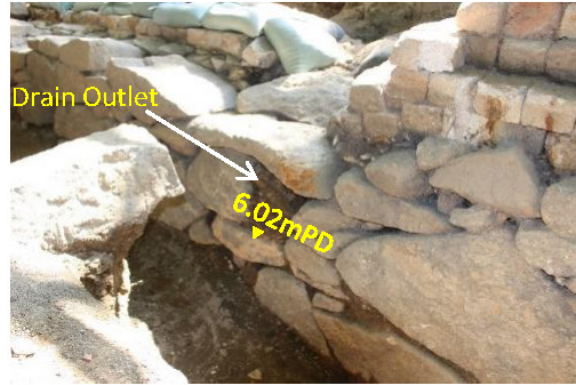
Drain outlet at end of Lane 5, looking southeast.
